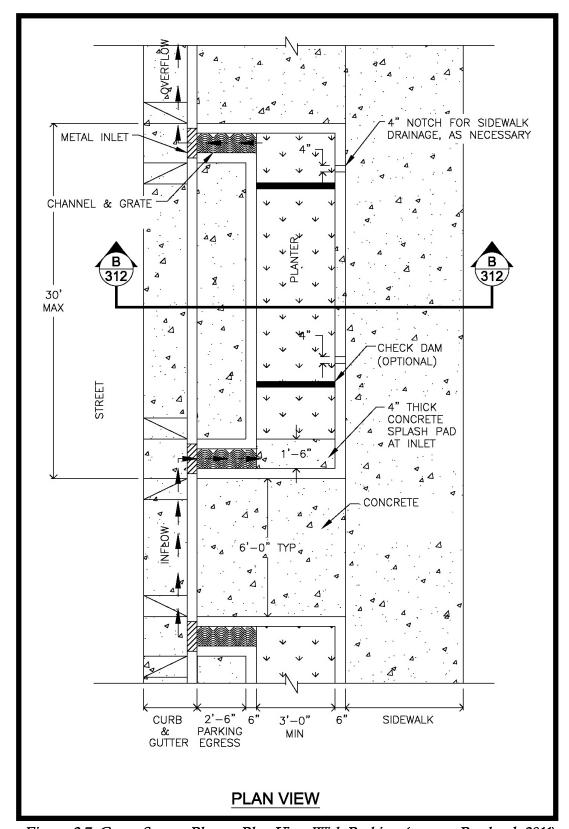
Green Streets Planter Plan View With Parking (source: Portland, 2011)
